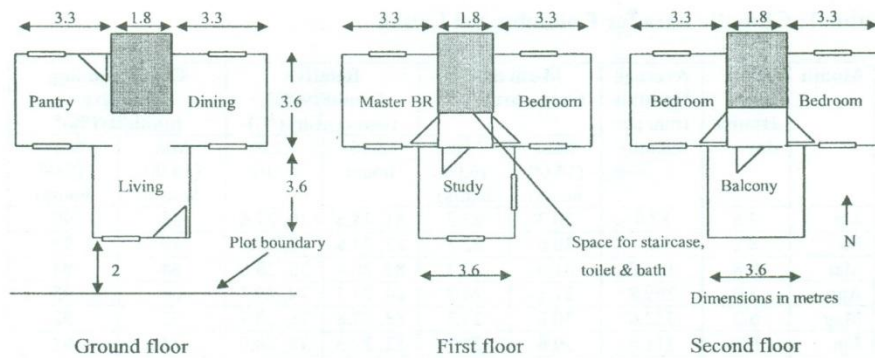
Ground floor, first floor and second floor plans of the modeled house
